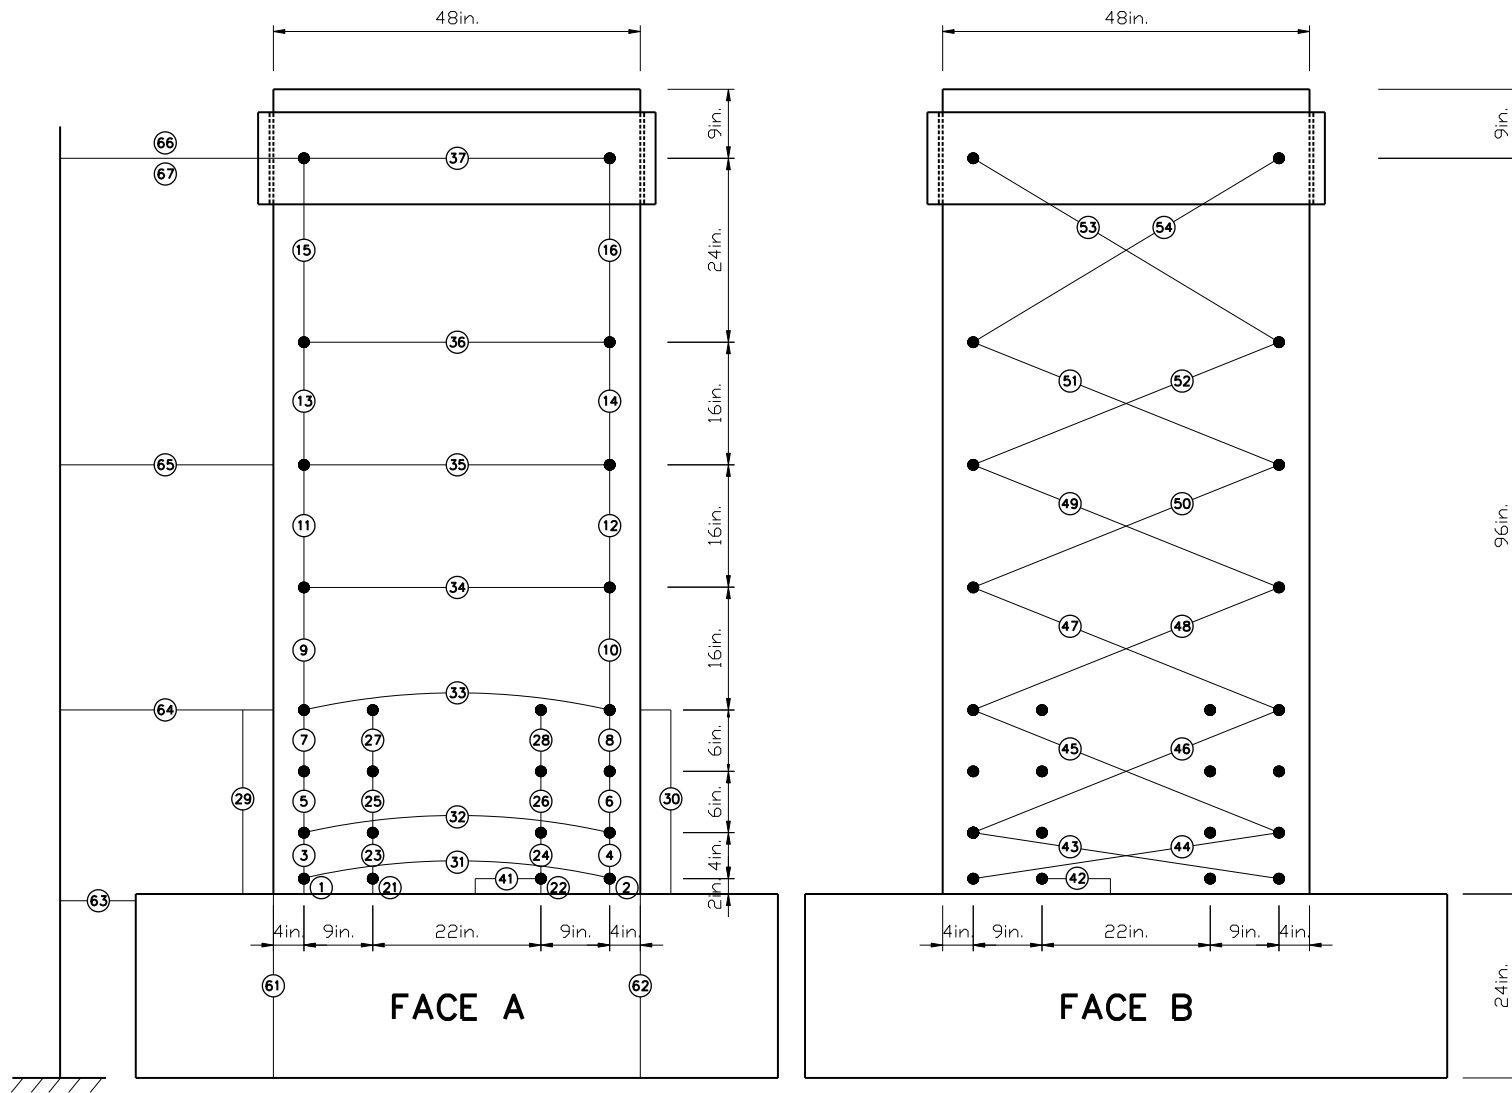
LVDT layout for specimens with aspect ratio 2.0
